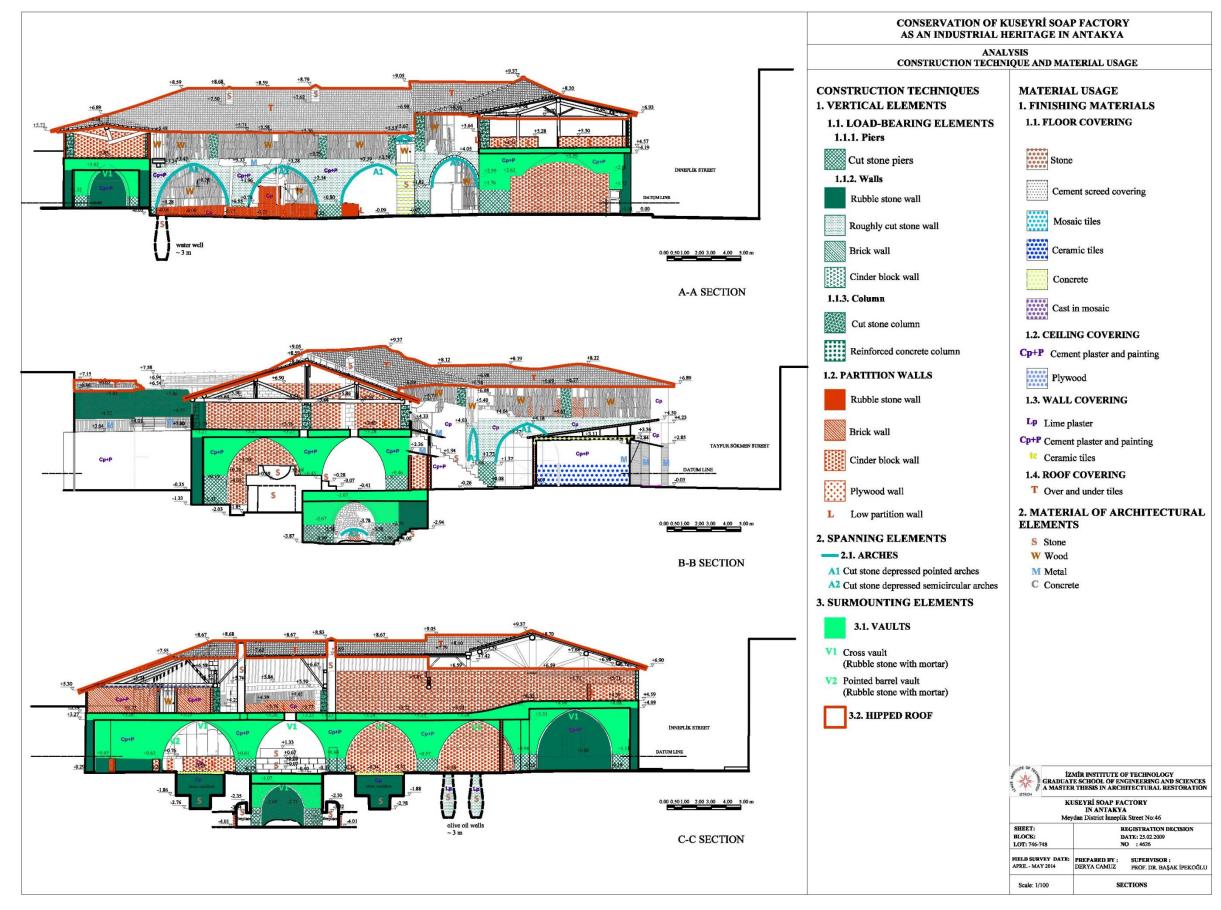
Construction technique and material usage – Section A-A, Section B-B and Section C-C
